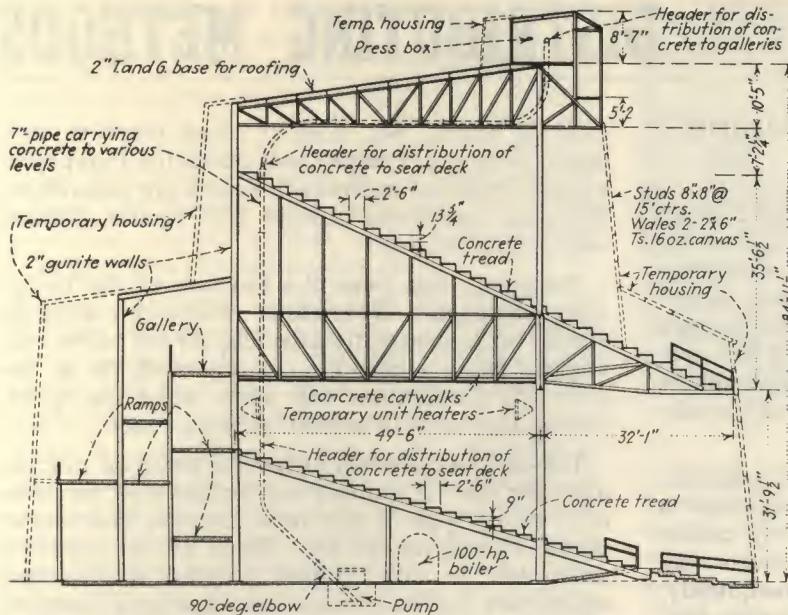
NEW STANDS for Detroit ball park are structural steel, with concrete seat treads and ramps. This cross section shows the plant layout for the concrete pumping distribution system. The stands were enclosed in canvas housing and heated by unit heaters during construction.
